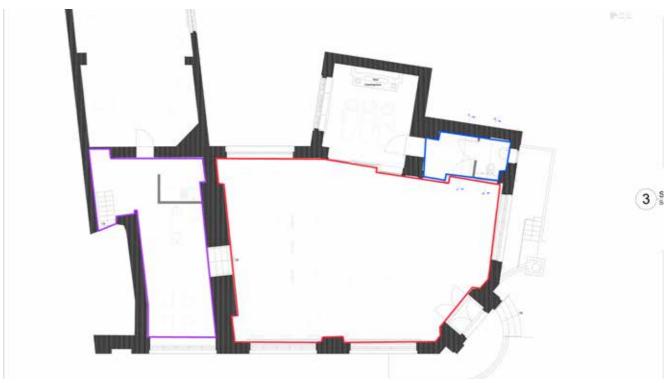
Ground Floor Plan of the building. Red = Bank Hall. Blue = Waiting Room/Ambulant W.C. Purple = Upper Bank Hall
